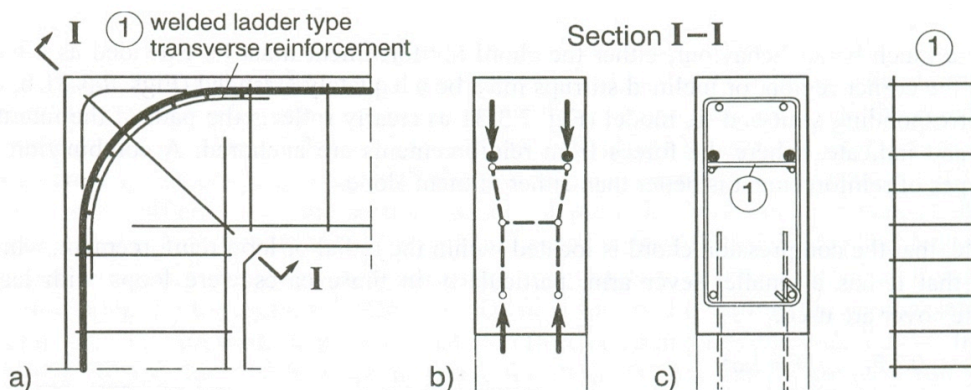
Transverse reinforcement of a beam-column-connection with closing moment.
